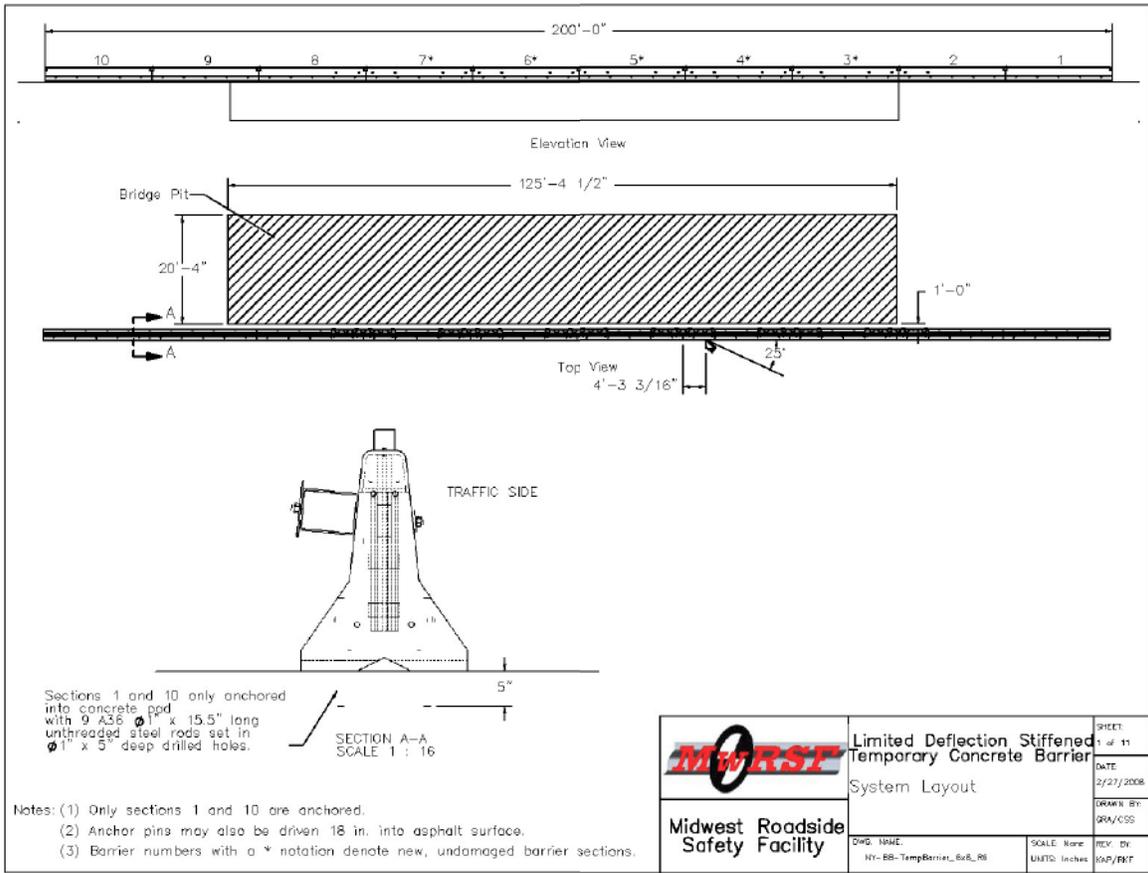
Stiffened Temporary Concrete Barrier System Layout (English), Test NYTCB-3
